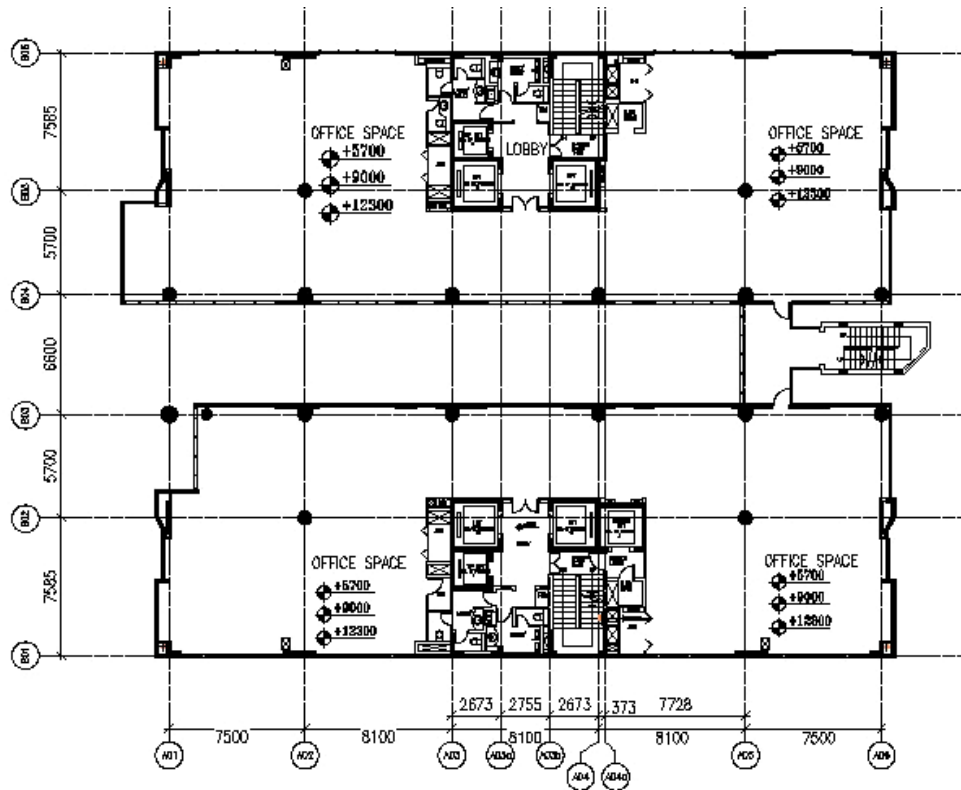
Birla Corporate Office, New Delhi: First, Second, Third Floor Plans
